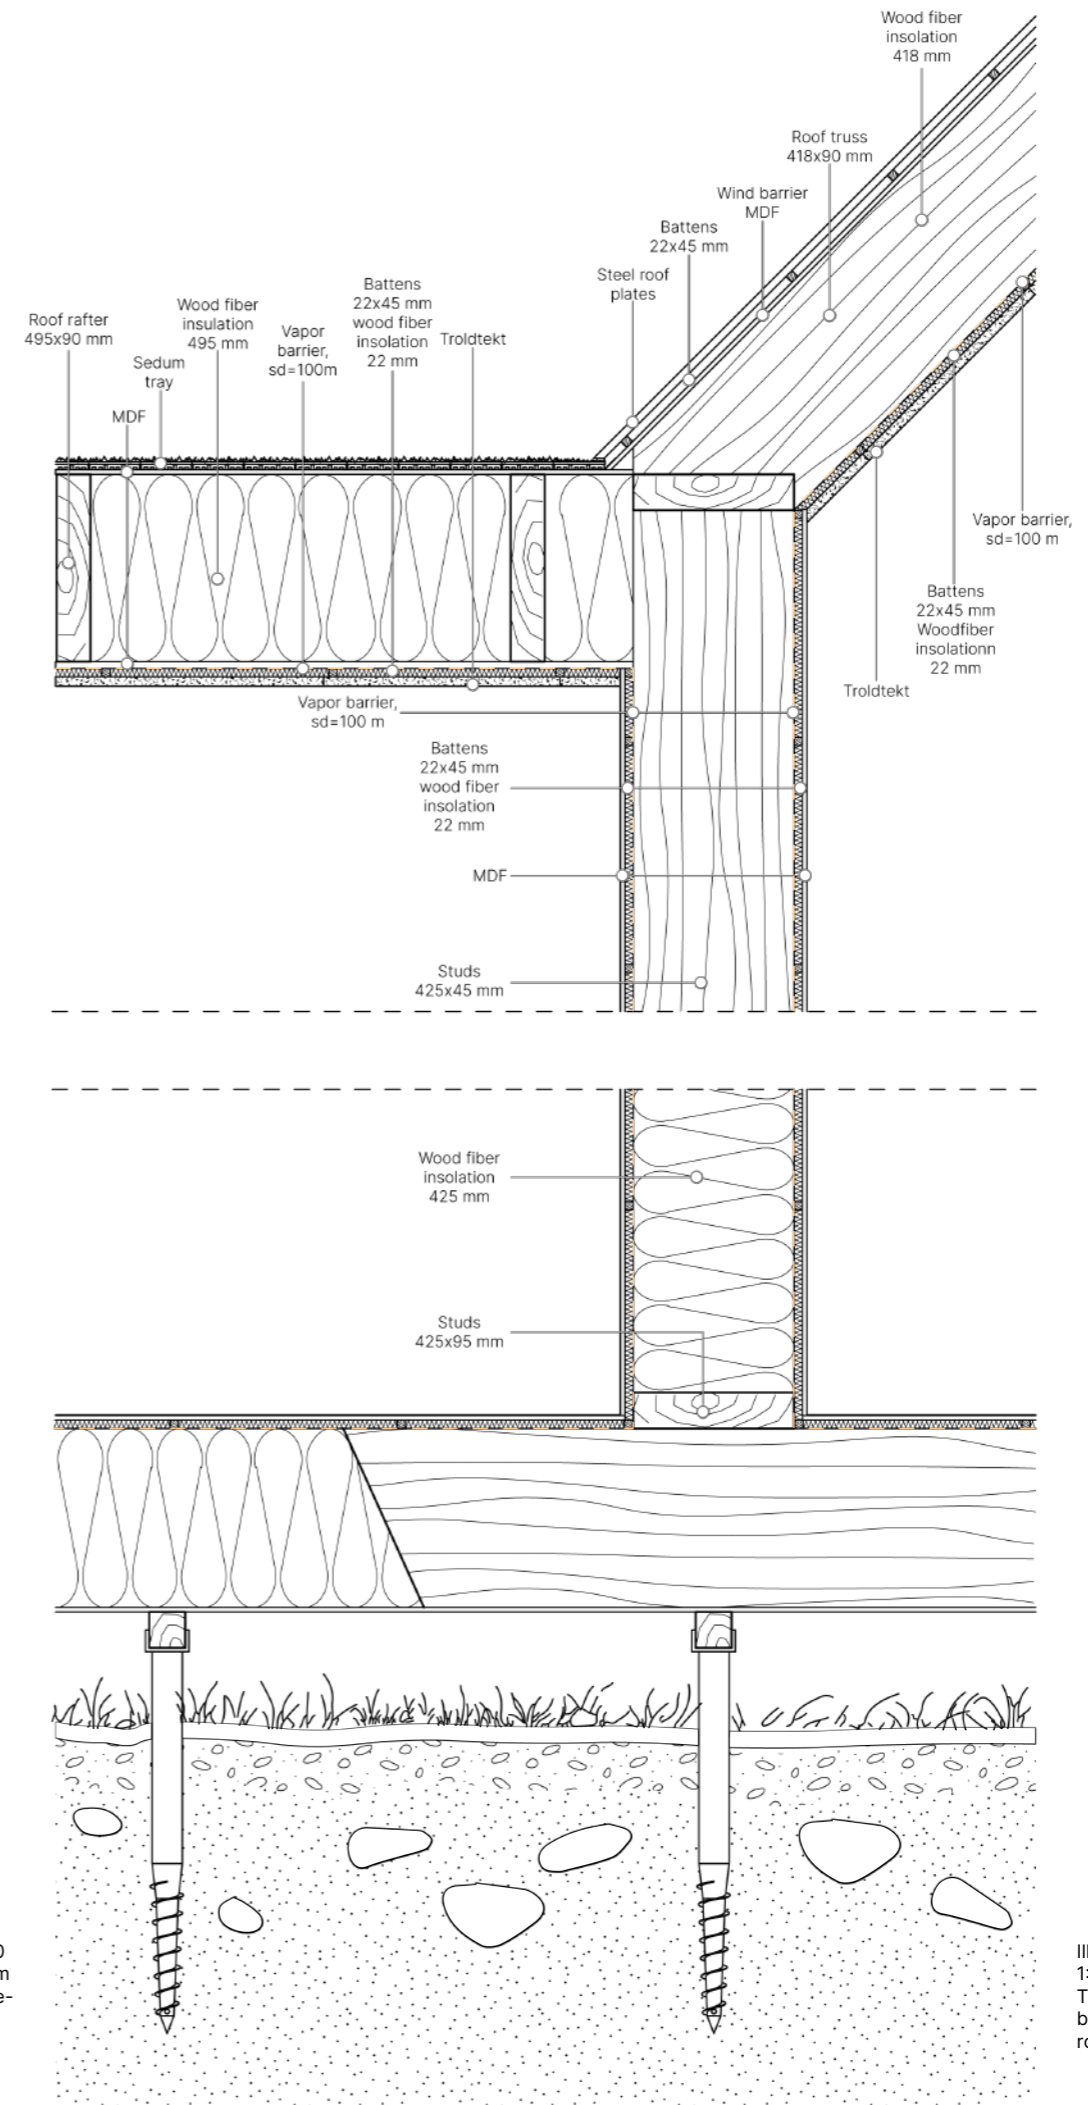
Own technical detail 1:20 Technical detail of how the roof between group room and common room meets
